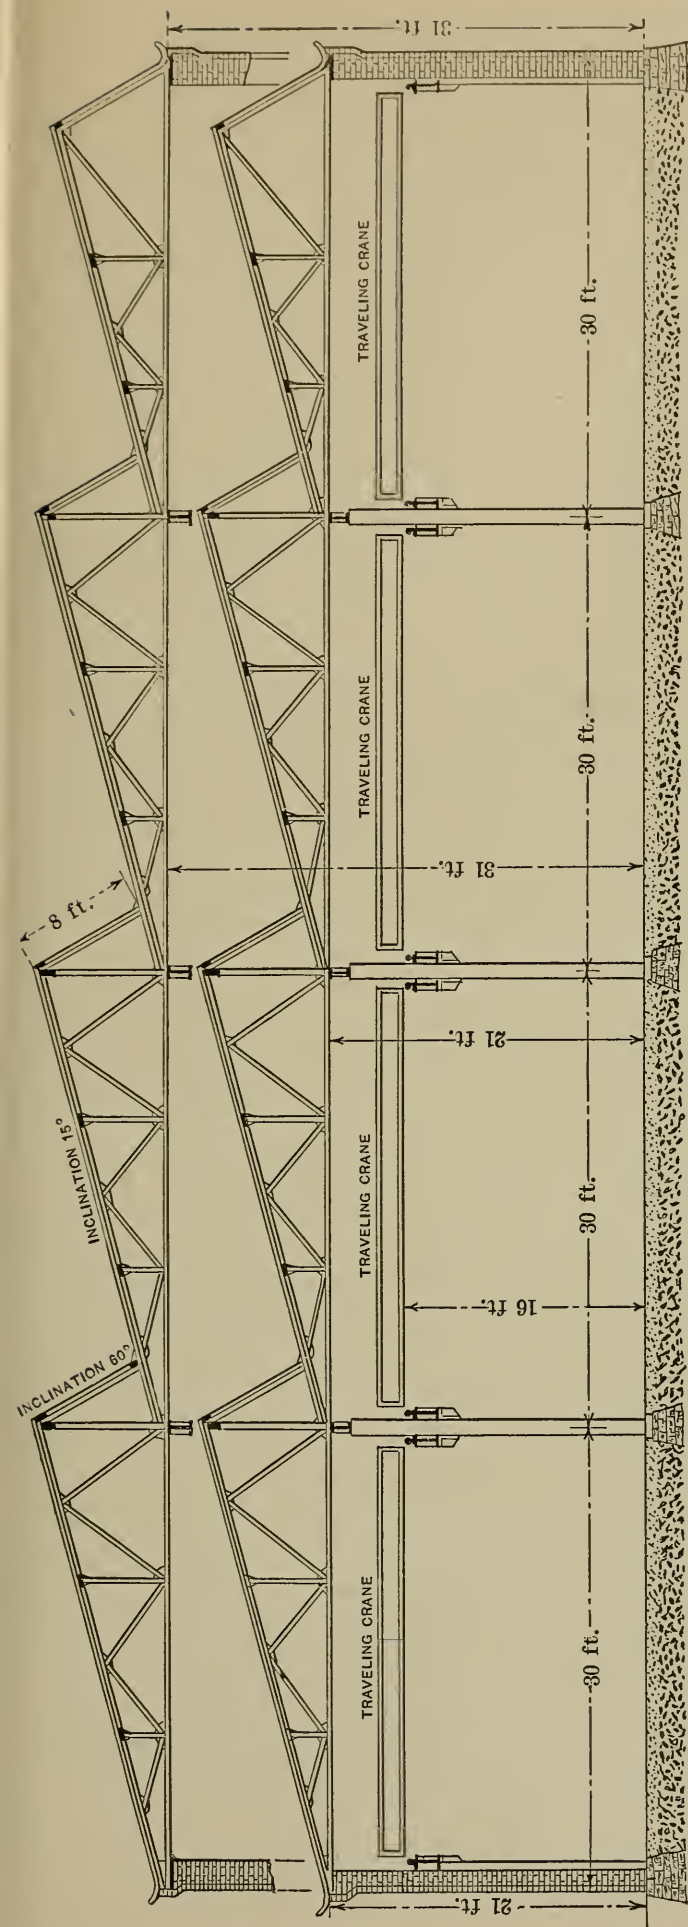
Longitudinal Section of Machine Shop with Saw-tooth Roof of Steel Construction.
